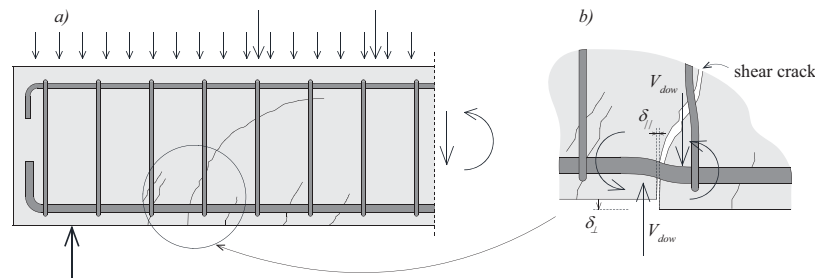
(a) Concrete girder with existing shear cracks and (b) local dowel mechanism of the longitudinal reinforcement and the stirrup at the crack intersection.
